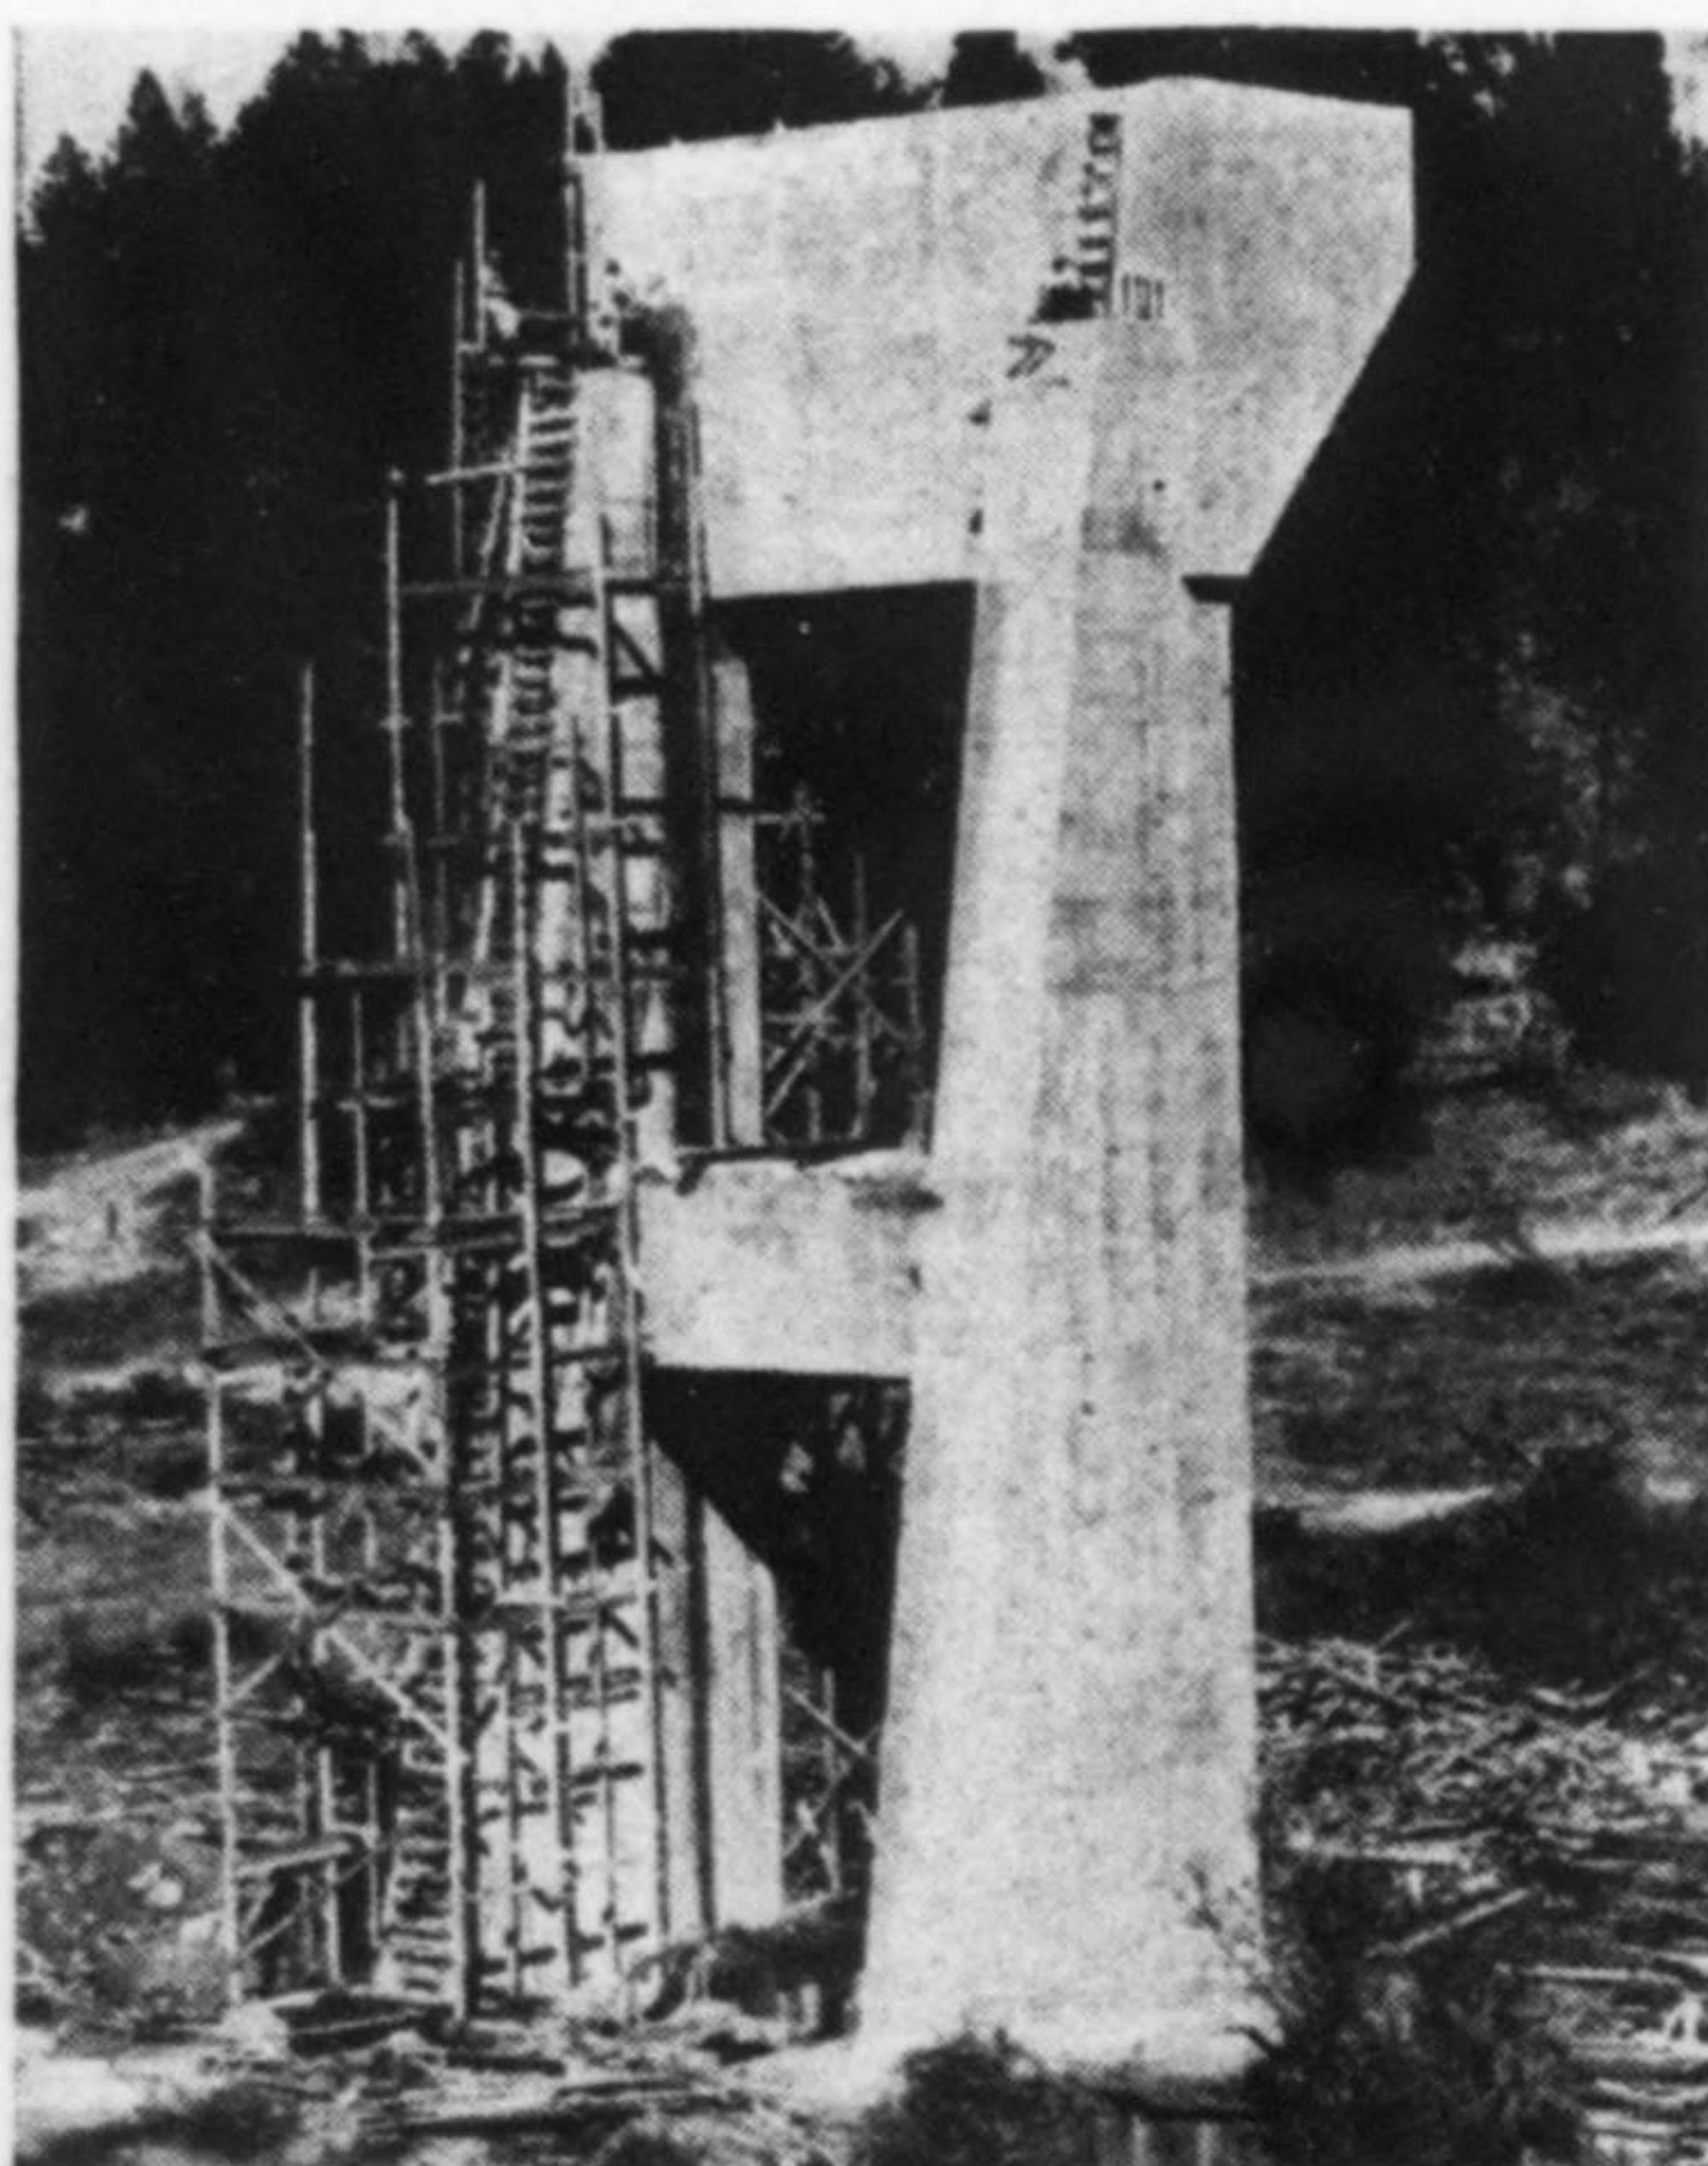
Abutment 1 complete except for concrete surface finishing, which is in progress. The greater part of the abutment will be embedded in an earth-fill.
